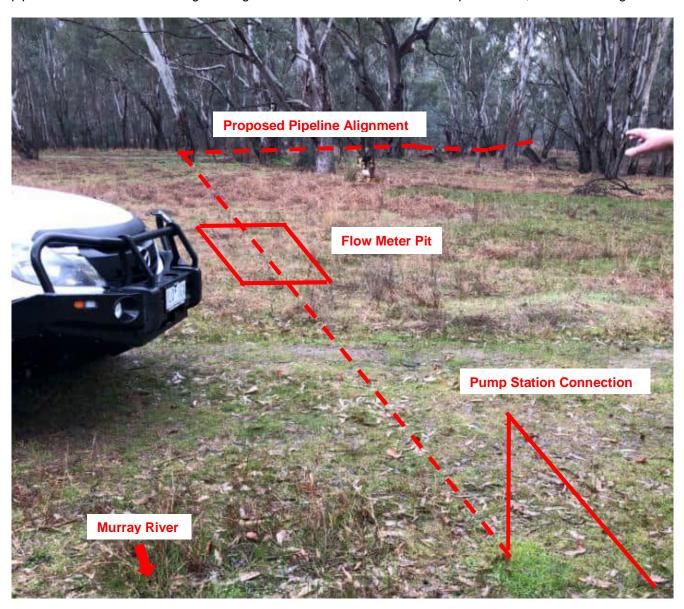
Pipeline to Pump Station Connection and Alignment (at pump site and RD 0, looking east)
